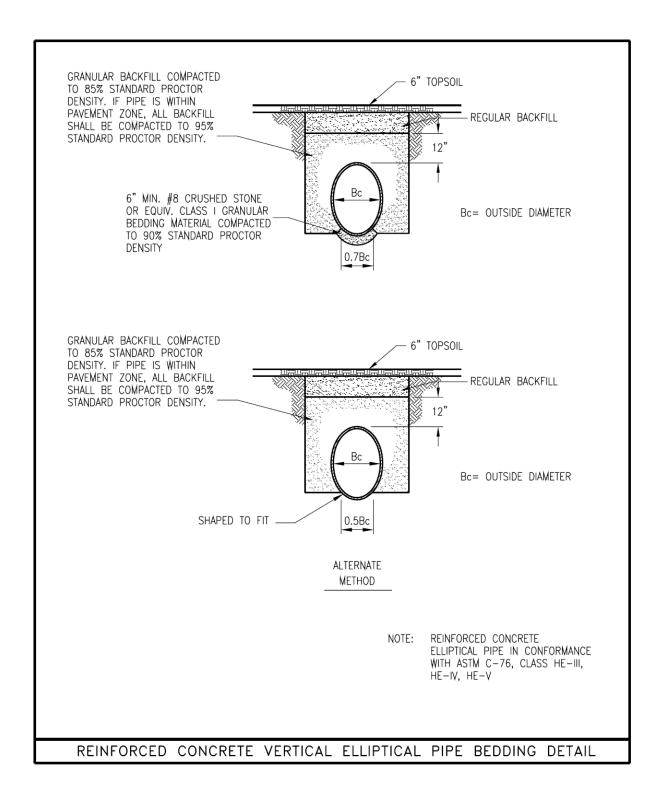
Reinforced Concrete Vertical Elliptical Pipe Bedding Detail
